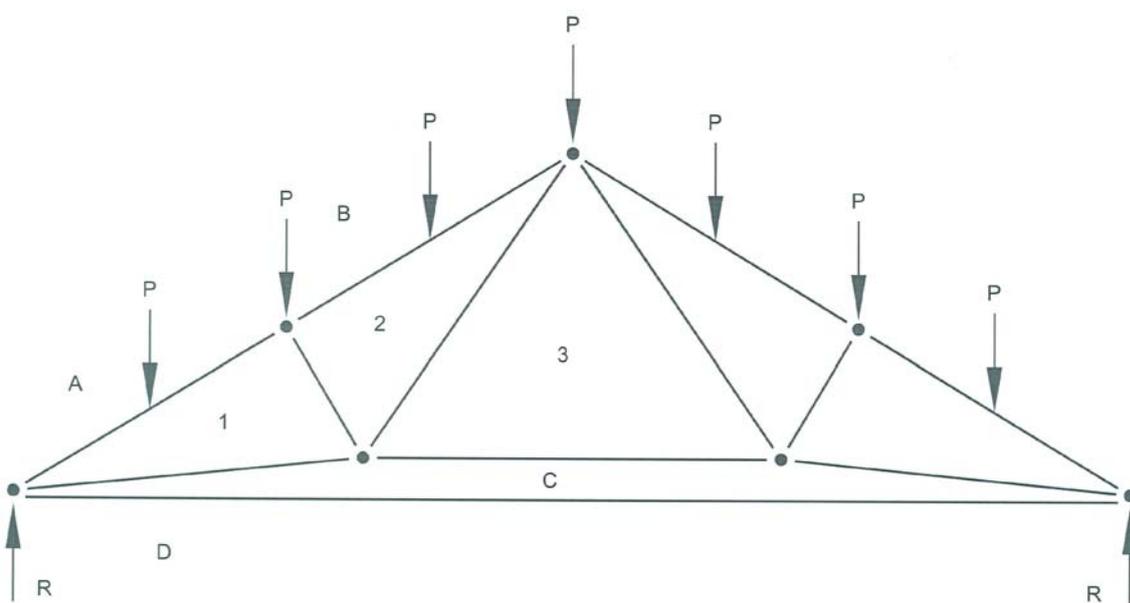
This shows the placement of the unit loads for the load test with the loads located at purlins.
